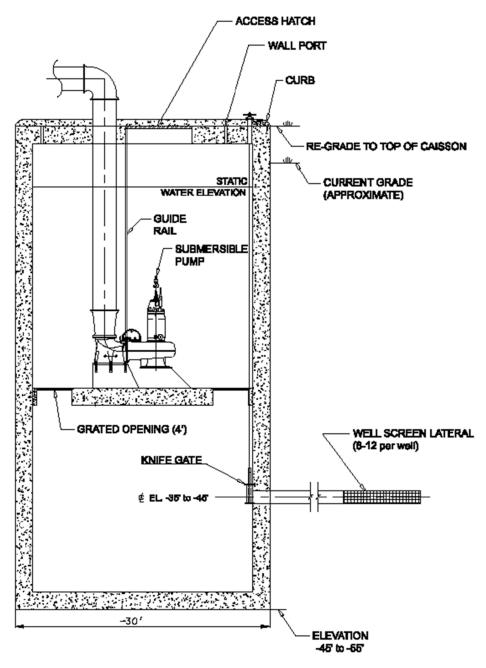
Cross-Section View of a Typical Radial Collector Well System (FPL 2014-TN4058)
